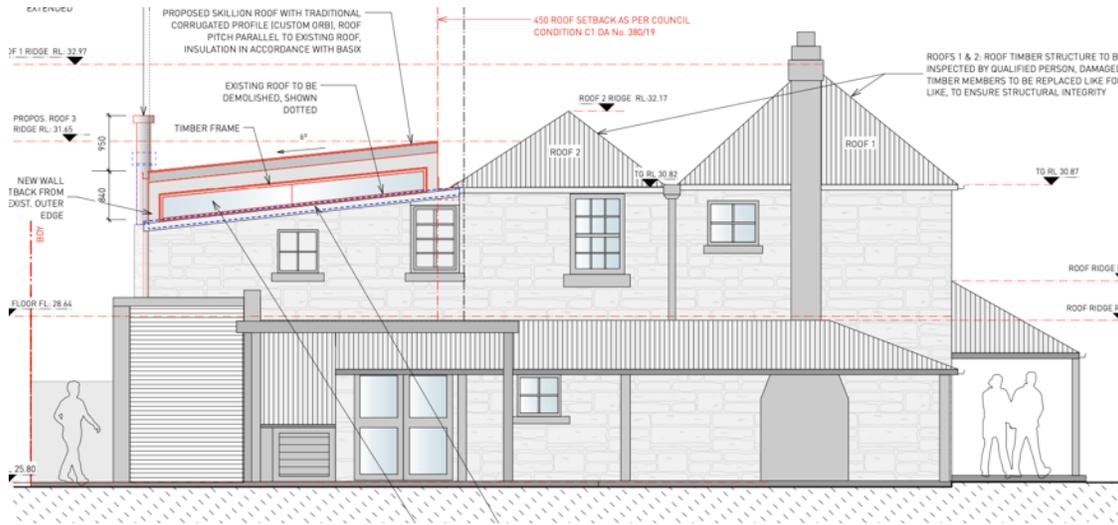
, West Elevation, CC33, U+I Building Studio, 10/02/21
